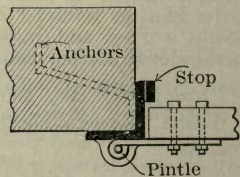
Swing Fire Door Hung to Angle-iron Frame.
